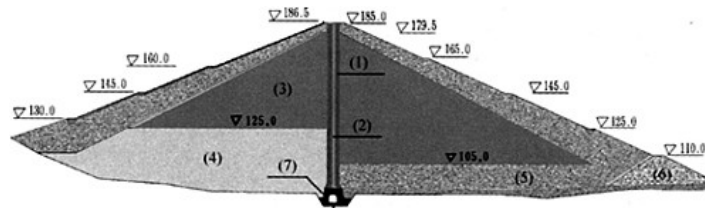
Dam's section structure: (1) transition zone; (2) asphalt-concrete; (3) ballast mixes; (4) decayed rock; (5) rock ballast; (6) displacement hull; (7) concrete basement.
